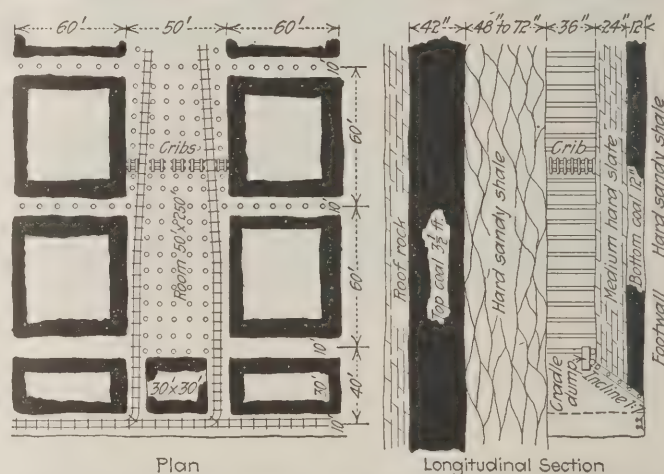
PLAN AND ELEVATION WORKING MIDDLE SEAM
